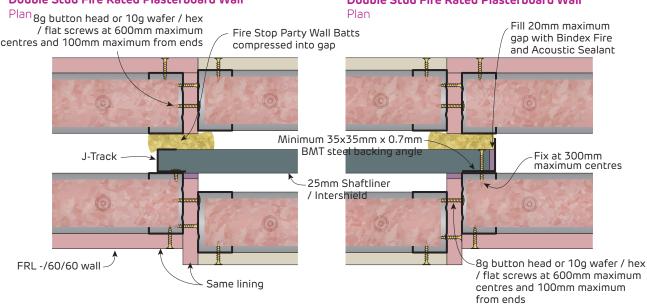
Interhome High-Rise Wall Transition to Double Stud Fire Rated Plasterboard Wall
